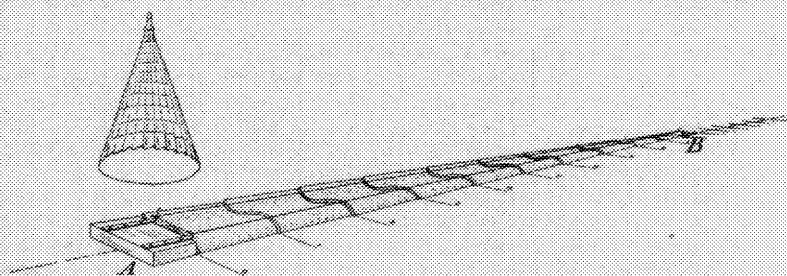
Perspective View of Method of Laying Out Tower Tiles.
